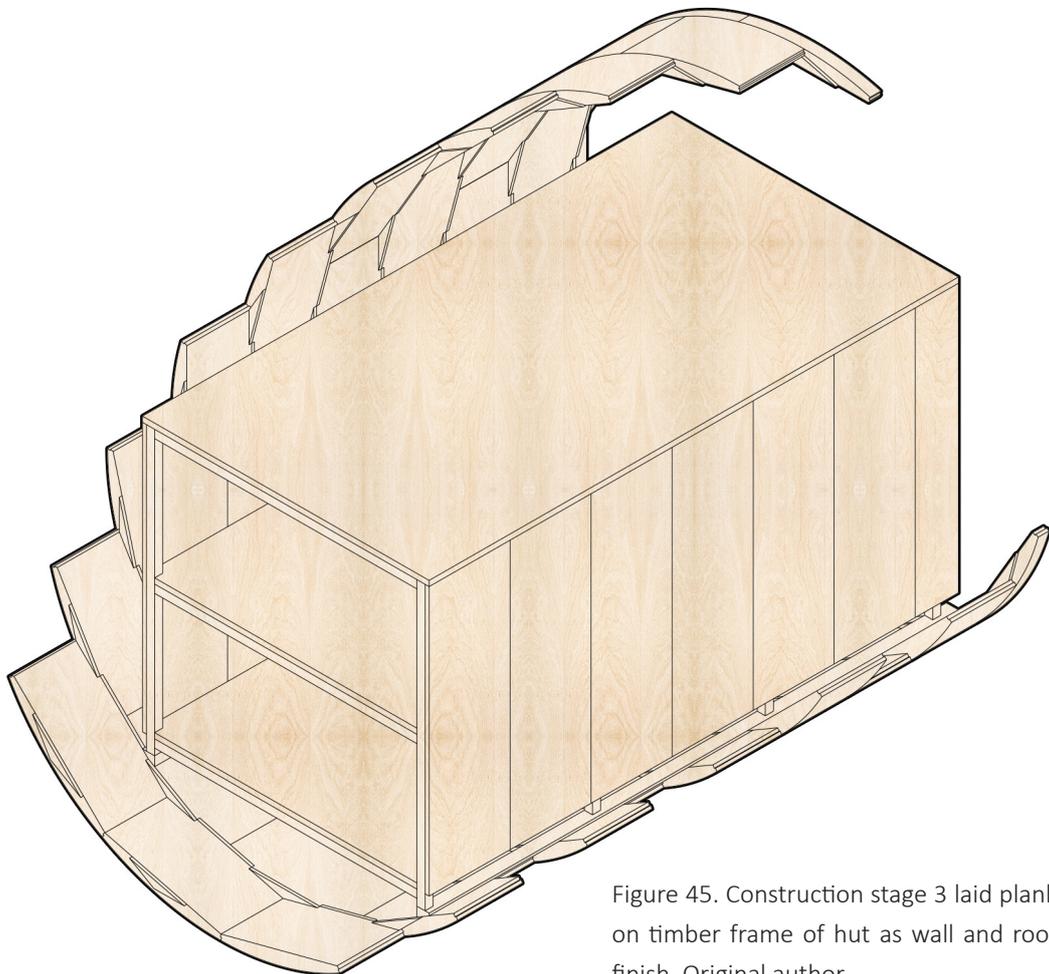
Construction stage 3 laid plank on timber frame of hut as wall and roof finish. Original author
